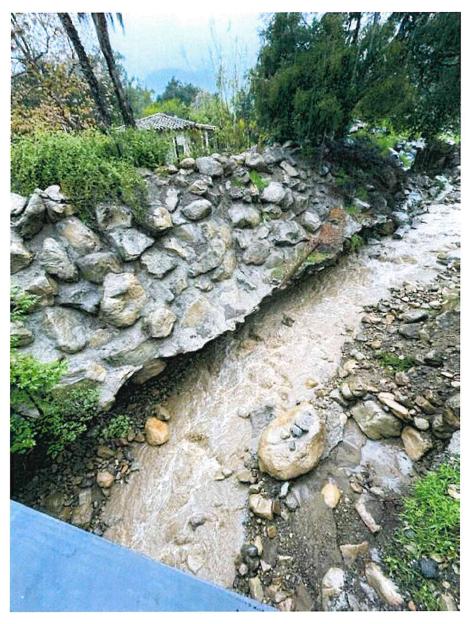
View of Romero creek looking upstream. Photo taken from bridge installed in 2022. Note undercut grouted rock slope protection.
